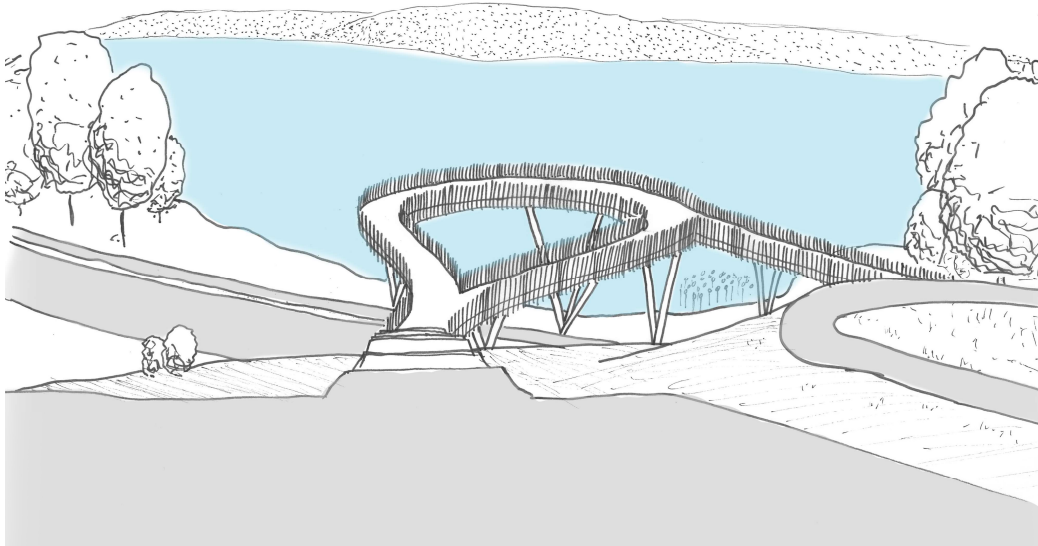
Bridge proposal 3 seen from Lakehouse.
